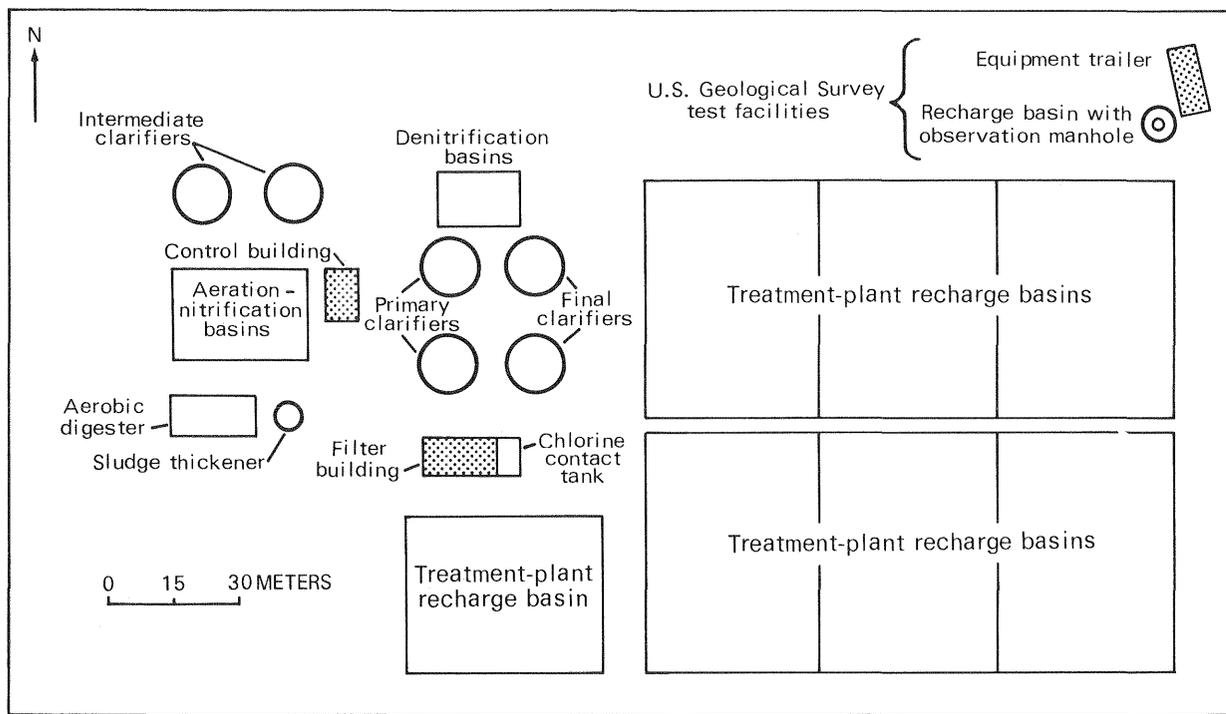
Layout of advanced wastewater-treatment plant and U.S. Geological Survey testing facilities.
